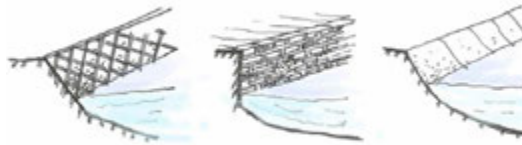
Artificial Revetment Materials (from Left to Right): New Porous Concrete Materials, Traditional Pebble, Cast-In-site Concrete or Grouted Rubble.
